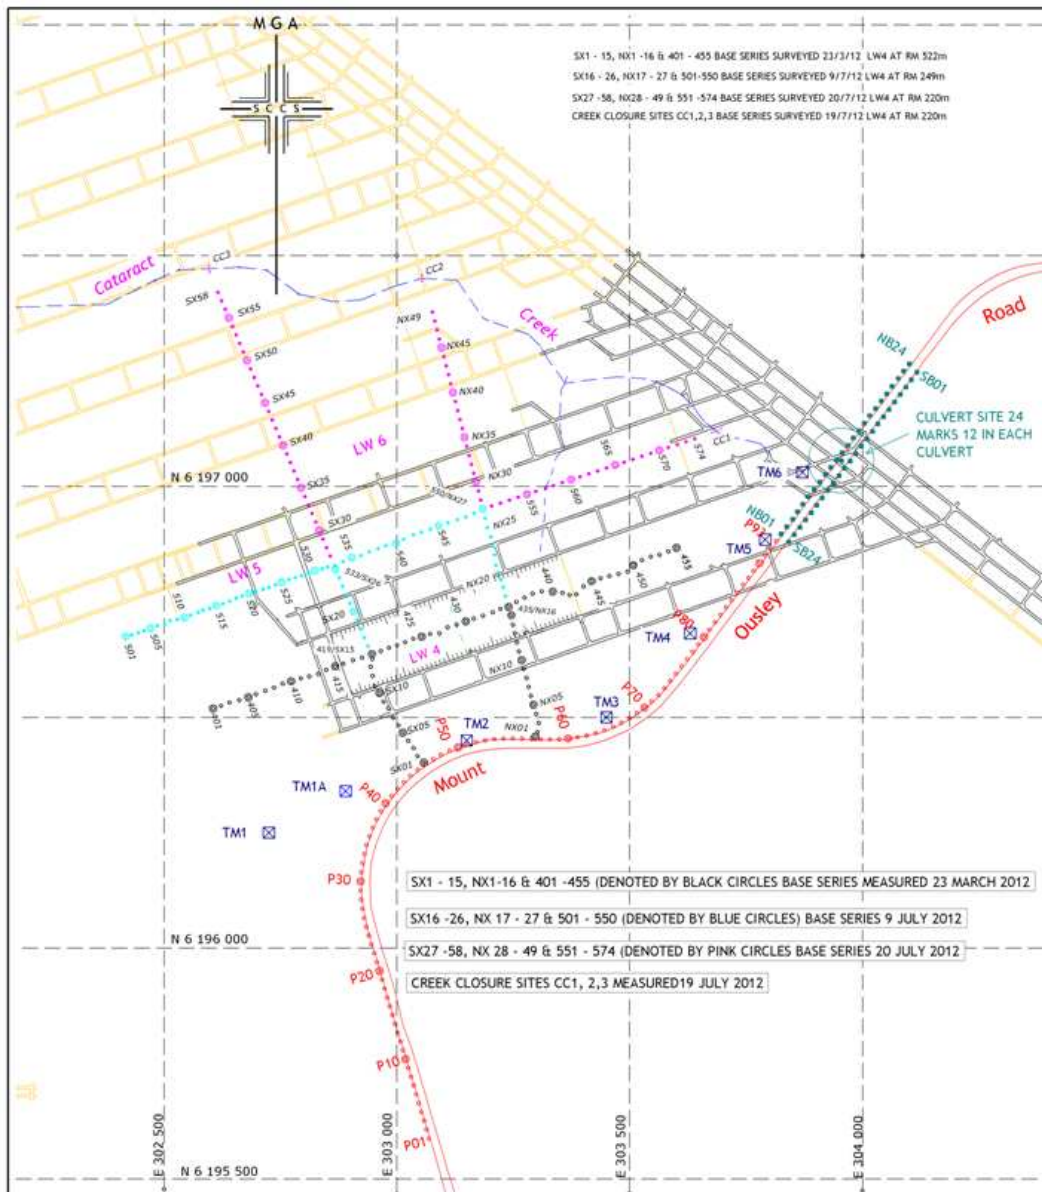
Site Plan Showing Location of Survey Monitoring Pegs along Mount Ousley Road
